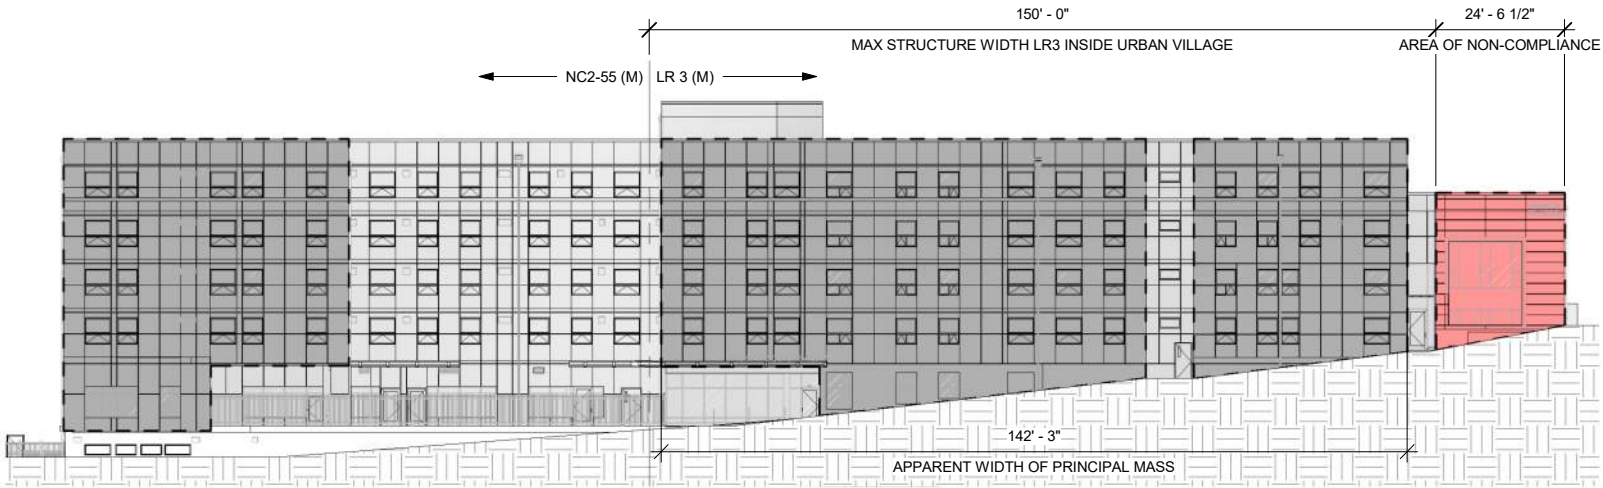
Elevation showing area of non-compliance, total building width, and apparent widths of principal massing elements.
